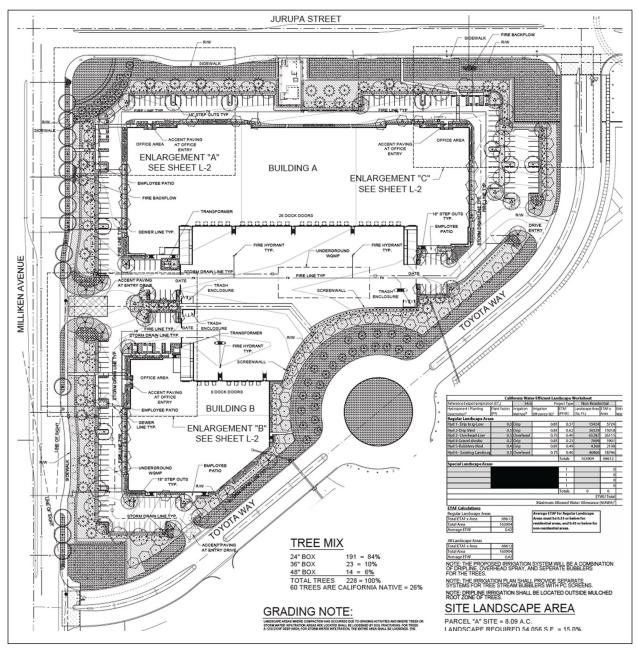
CONCEPTUAL LANDSCAPE PLAN
